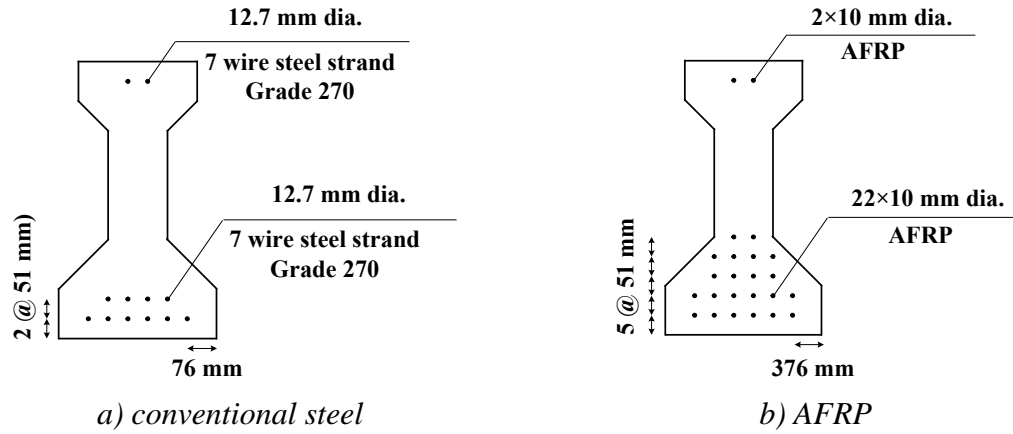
Prestressing layout of the AASHTO I girder (Type I)
